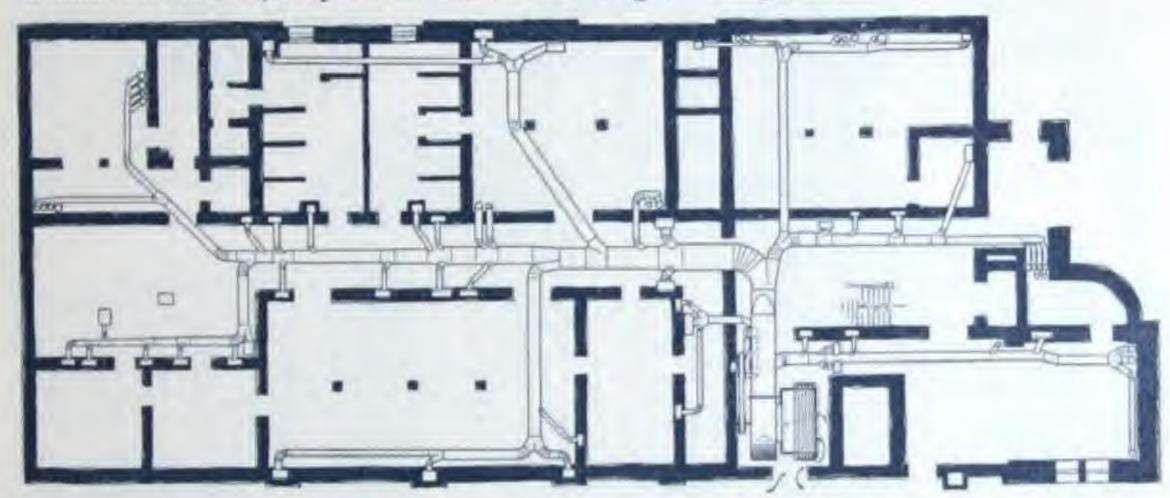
HERSEY MEMORIAL BUILDING, BANGOR, ME., BASEMENT PLAN.
